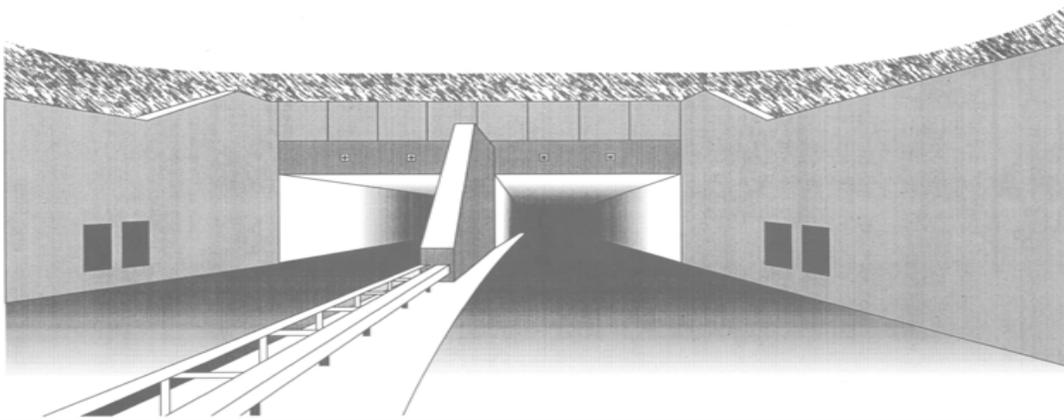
Example of recirculation dividing wall from BD78/99 [17]
